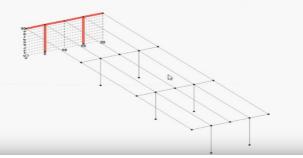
HOLE STRUCTURE METRO BRIDGE
